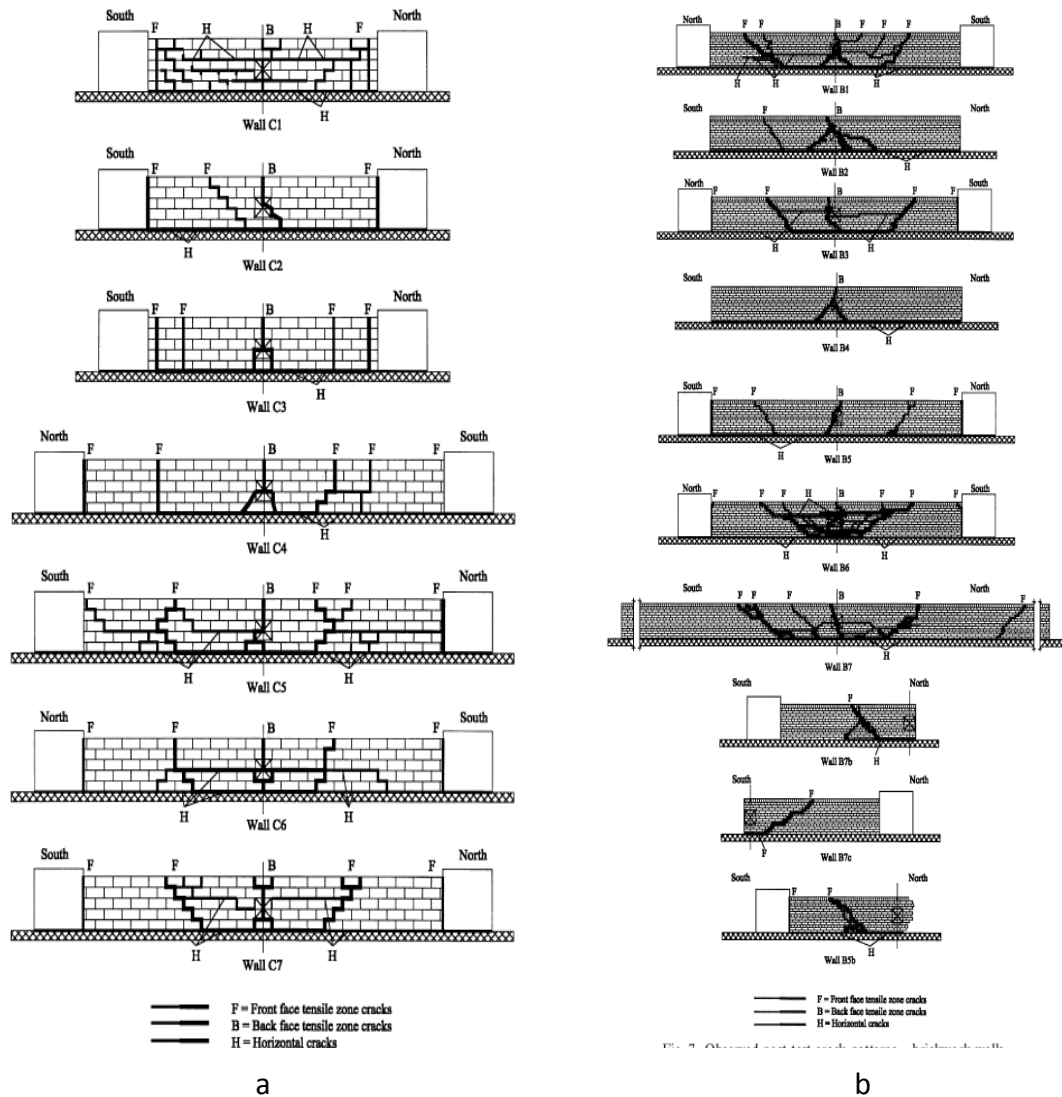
Crack patterns developing on URM wall specimens constructed from: (a) blockwork and (b) brickwork (Gilbert et al., 2002)
